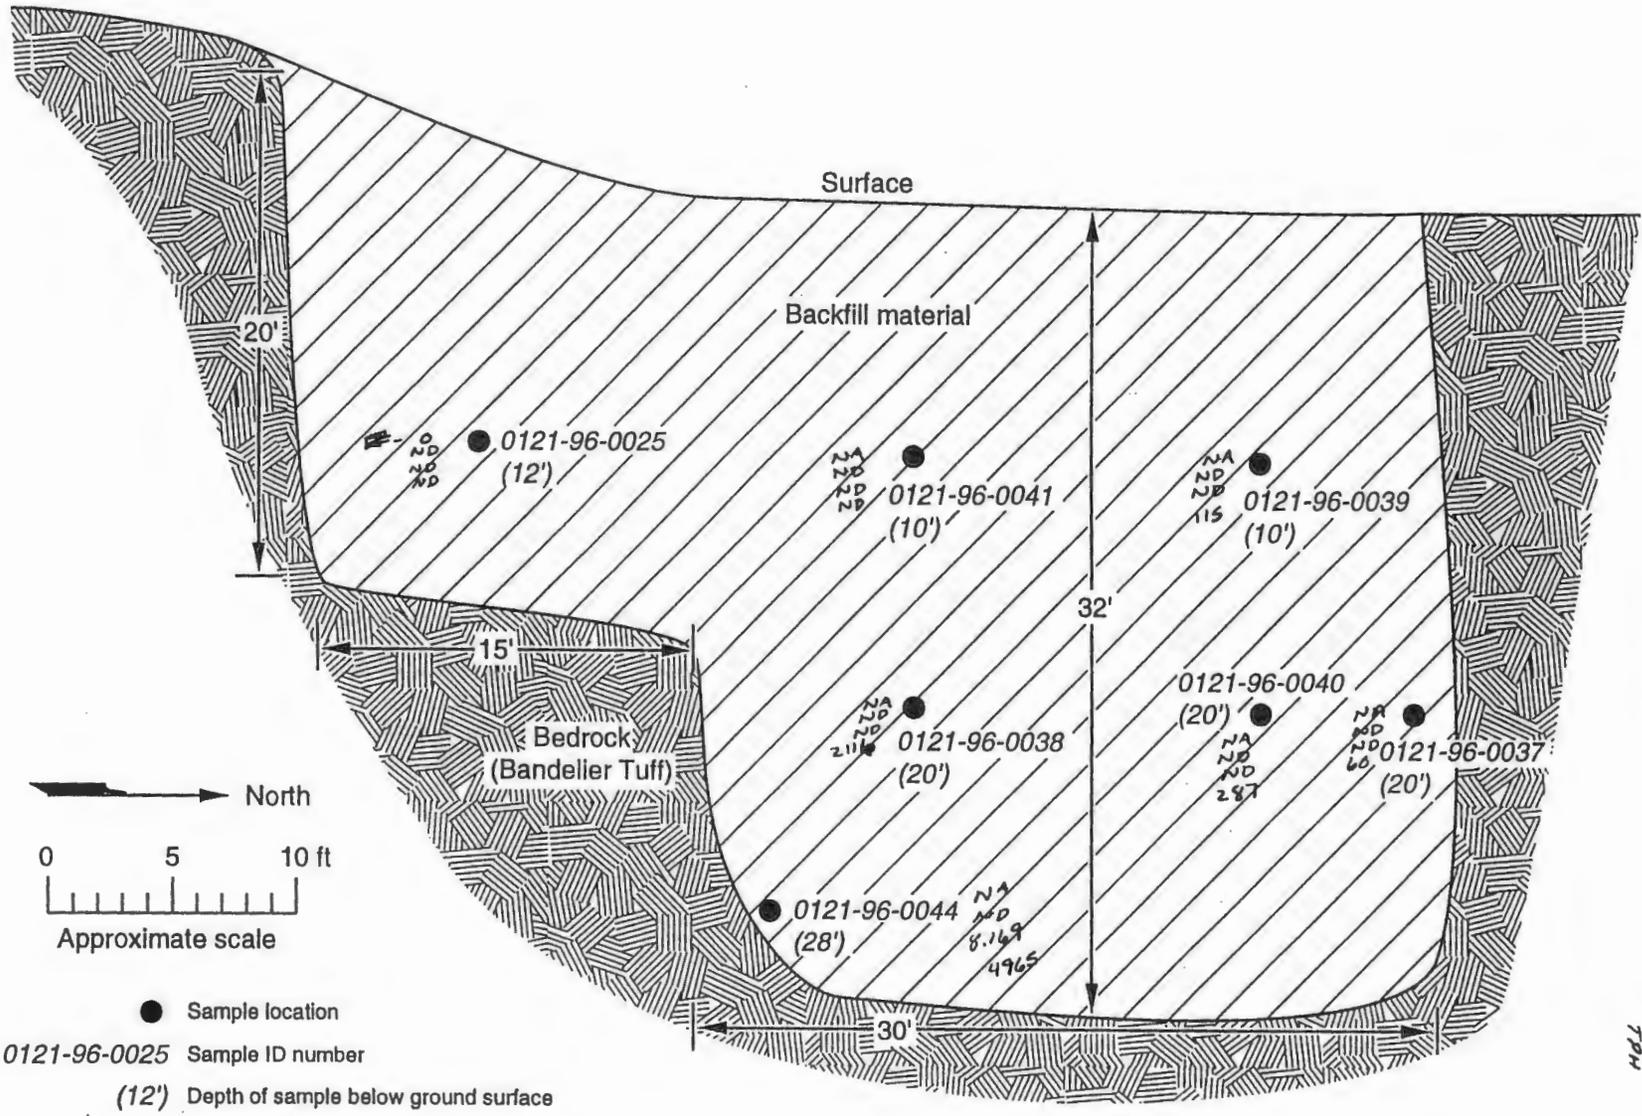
Approximate locations of confirmatory samples collected from west sidewall of excavation.
